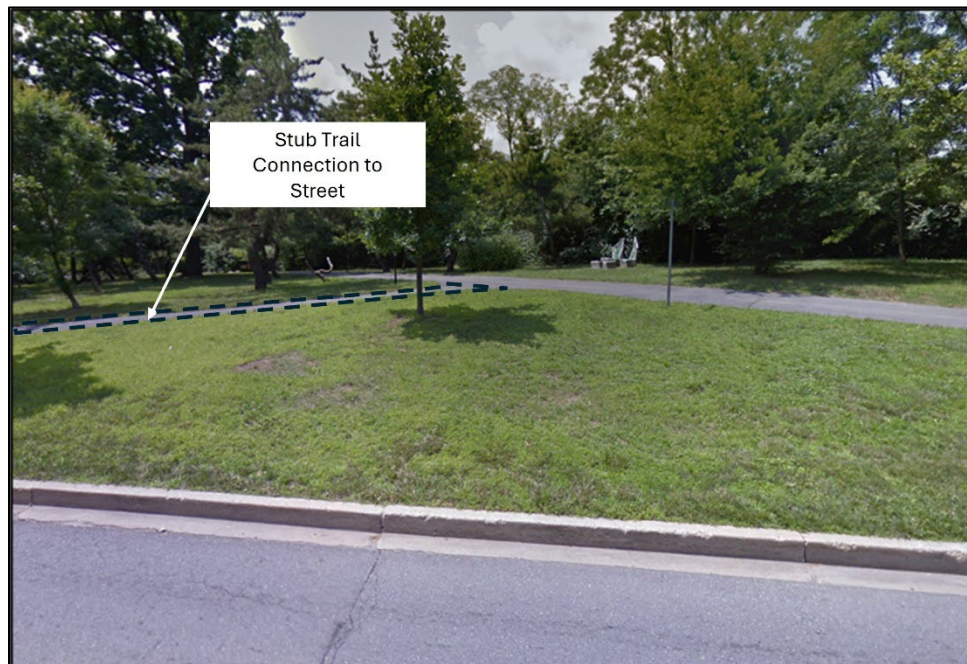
Metropolitan Branch Trail at Connection to Takoma Avenue/Fenton Street Intersection
